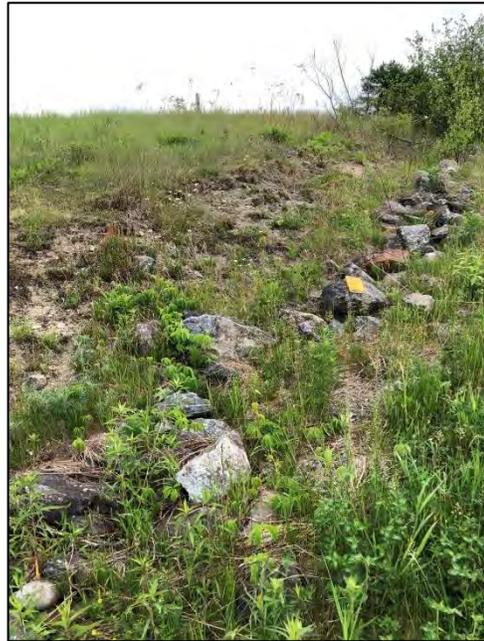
Northwest facing view of Bank erosion along Blanchard Rd upstream of the pond. The stone-lined swale directs flow directly into the pond.
